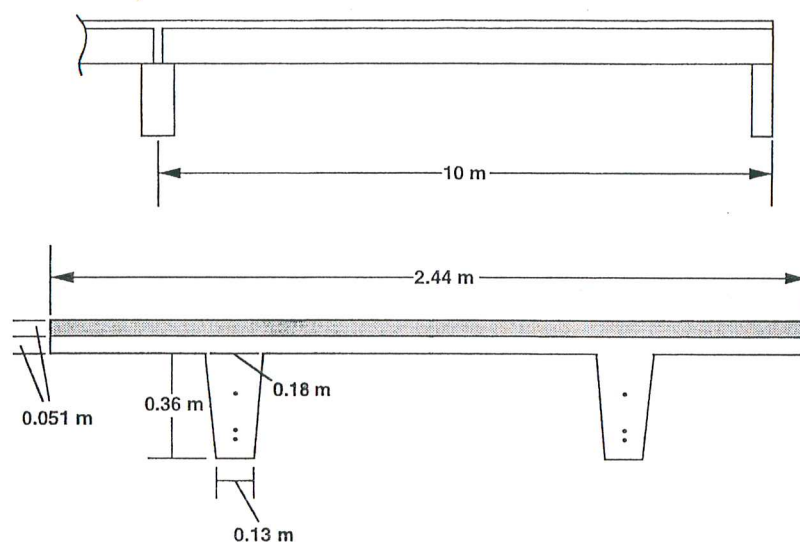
Sketch of a section of a reinforced-concrete, beam/slab, floor/ceiling system (from Problem 5.3 [10]).
